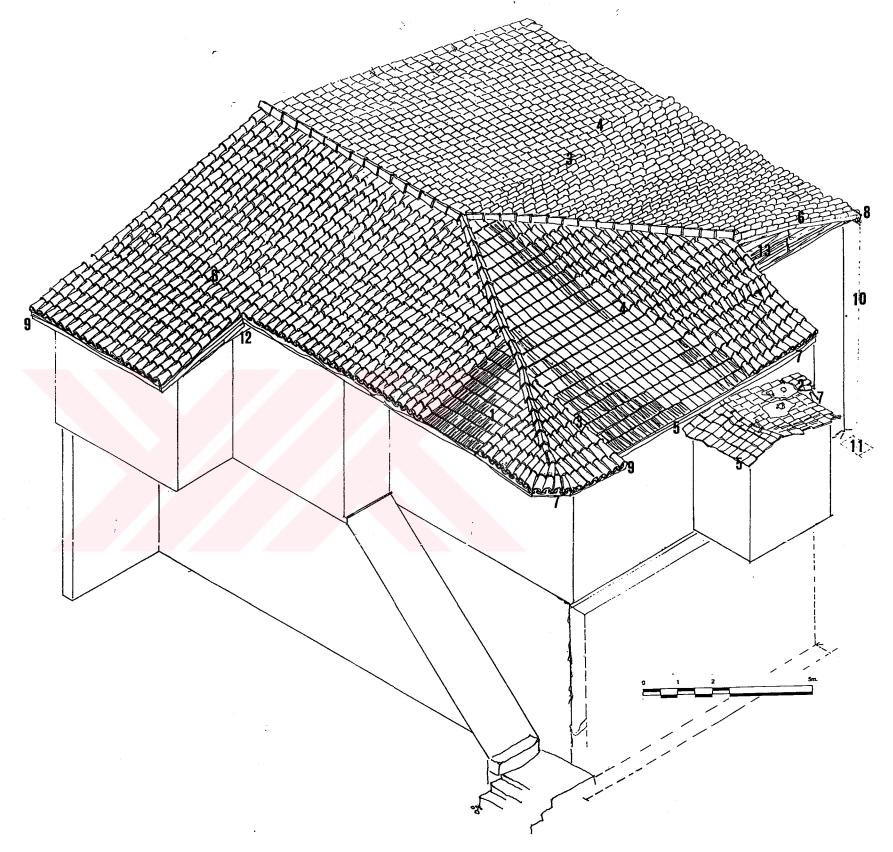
Typical Forms of Decay in Ankara Houses; Condition of the Roof of the House at Erzurum St., 48, in 1994
